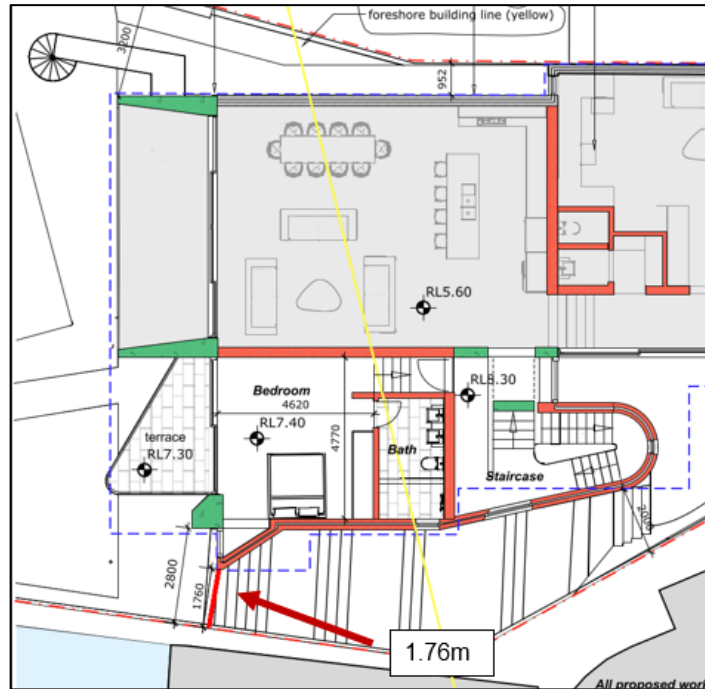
Side setbacks notated on mezzanine floor plan (blue dotted line shows outline of existing house)
